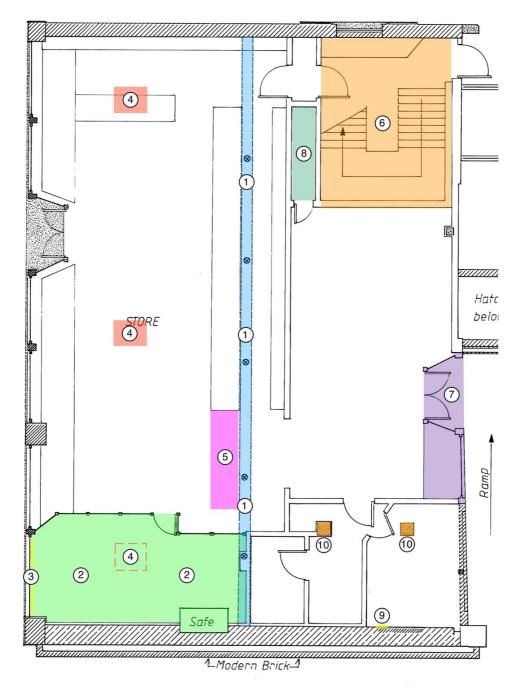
An annotated copy of the ground floor plan, front portion. North is to the top.
